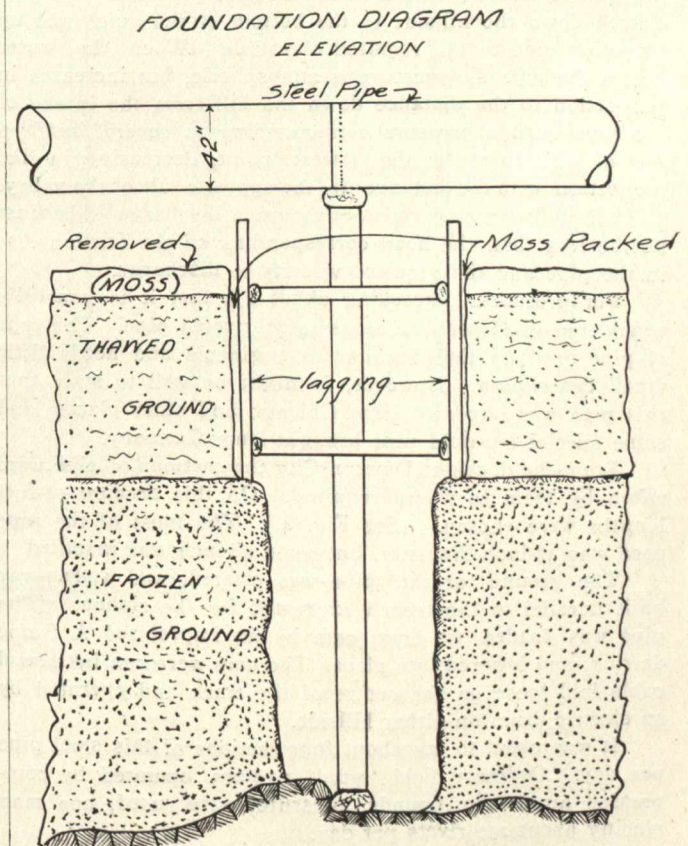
Cross-section of Ground and Foundation Diagram.
